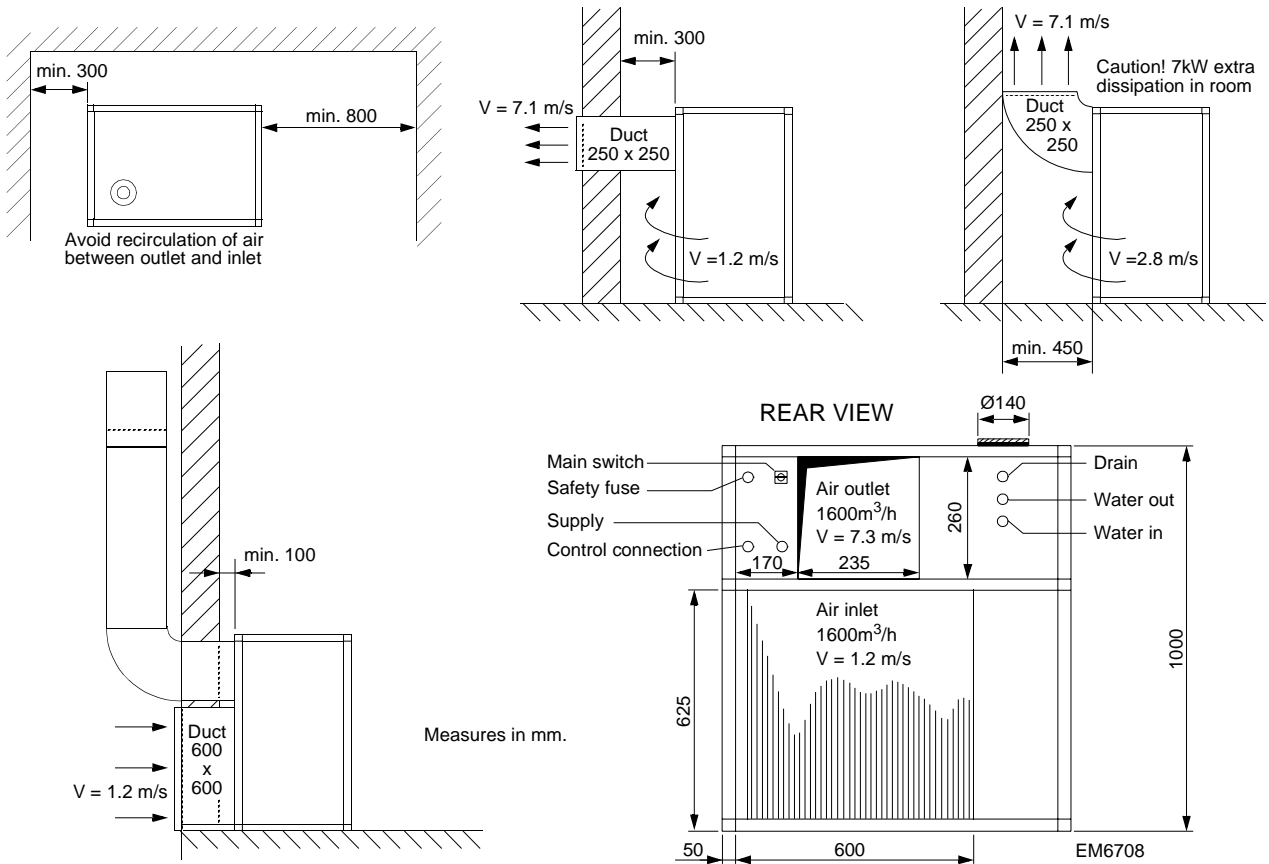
Dimensioned sketch of ZEM 1000 CT versions
